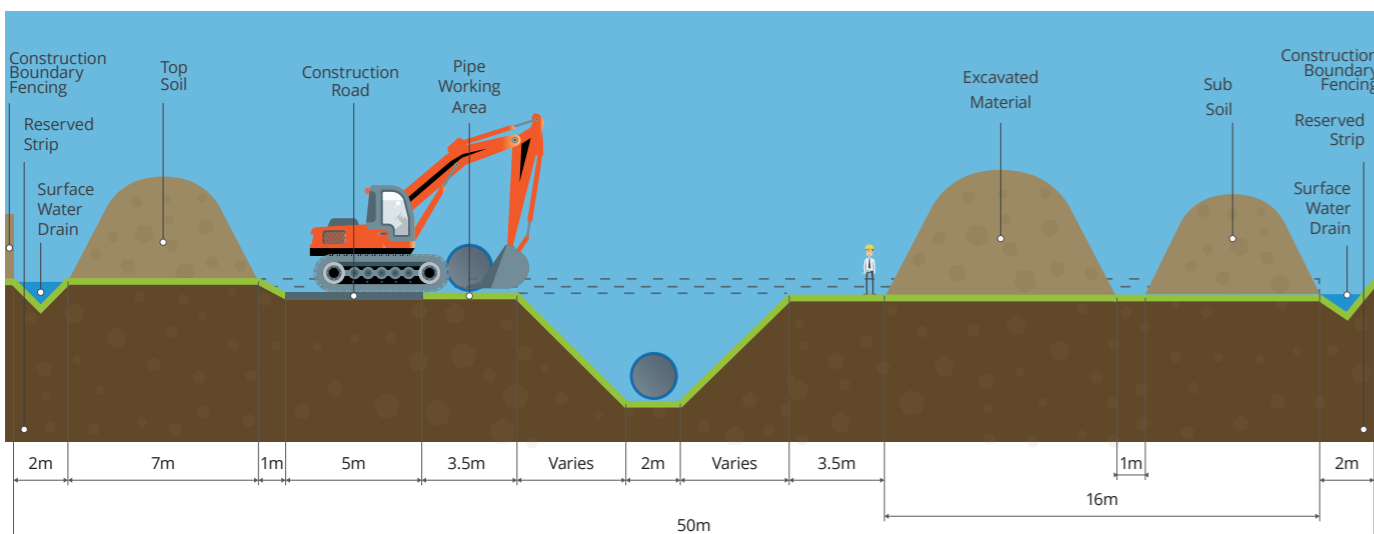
INDICATIVE TYPICAL CONSTRUCTION WORKING WIDTH CROSS SECTION
